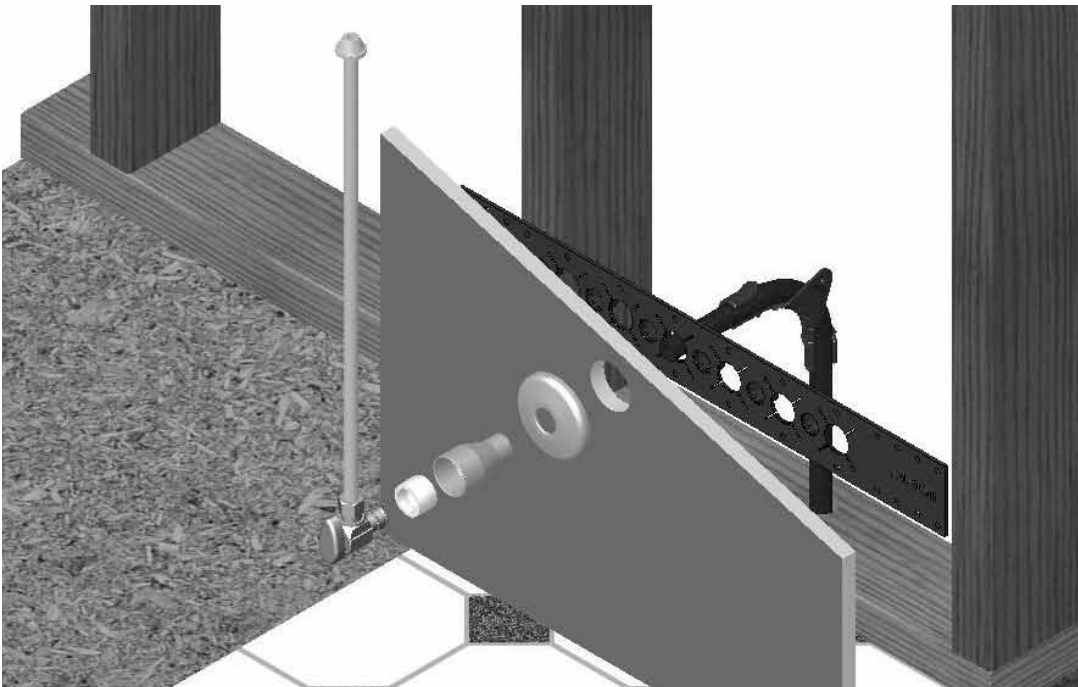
Installation Example of ProPEX Out-of-the-Wall Support System
